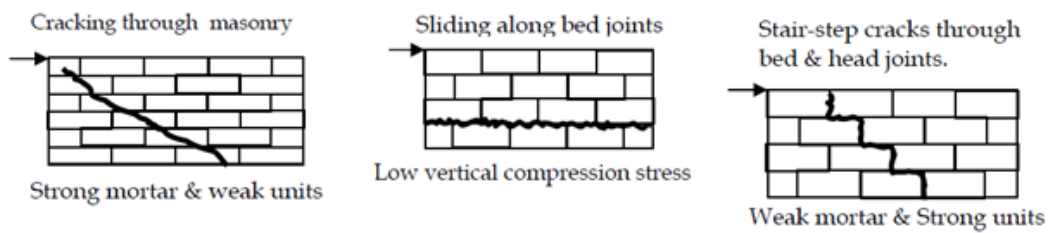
Shear failure of a masonry cross wall under lateral loading
